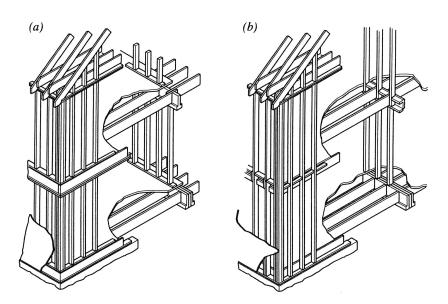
(a) Platform frame construction. (b) Balloon frame construction.
